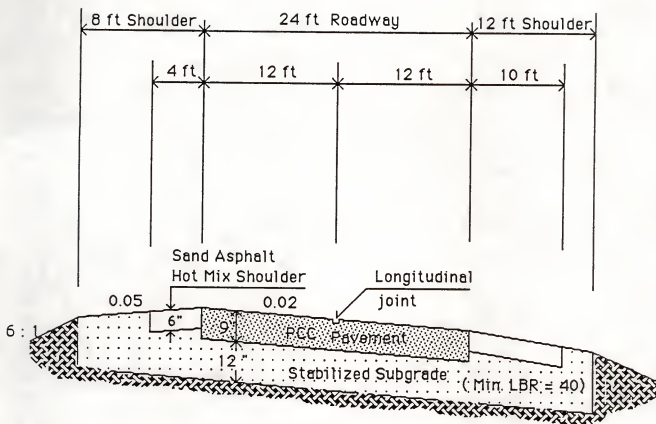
TYPICAL PAVEMENT SECTION OF I-10 CONCRETE PAVEMENT USING A CONVENTIONAL STABILIZED SUBGRADE
